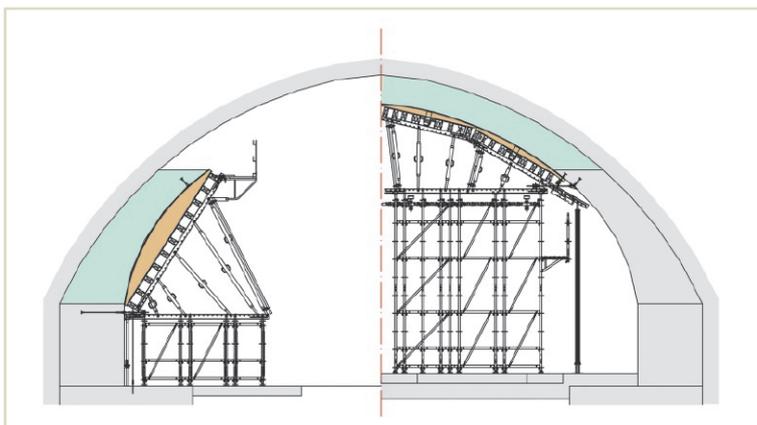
For the single-sided forming operations with correspondingly high formwork pressures, the tunnel formwork was back-anchored in the previously completed section. Widening the PERI UP shoring construction also served to carry out the execution of the complex reinforcement work.
